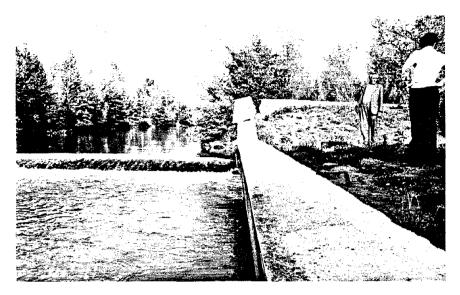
WEIR ON THE LEDRA RIVER: DAMAGED RETAINING WALL - FROM (10)
